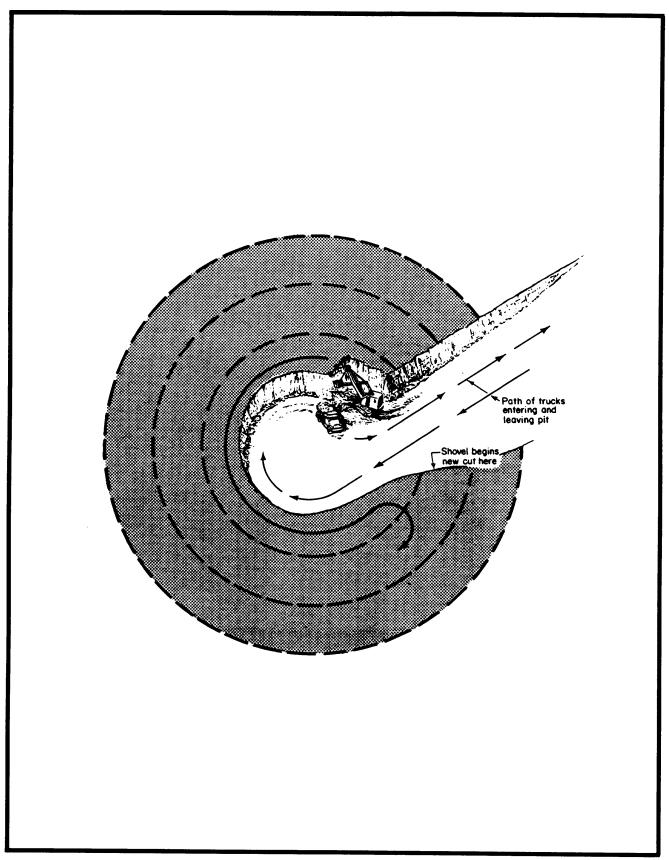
Layout and Development of a Subsurface Pit Using Circular Bench Method
